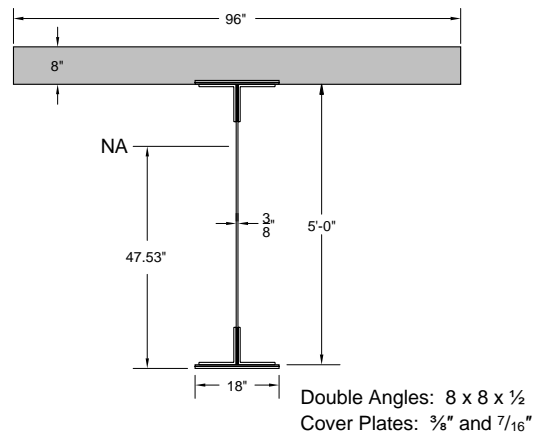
Dimensions of Composite Cross Section at Midspan of Suspended Span
